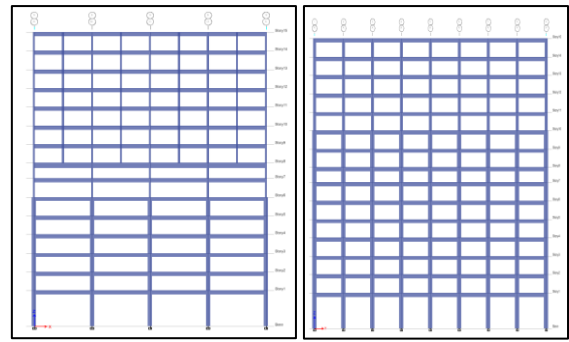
Elevation of Building Model-1 and 2 along y-dir & x-dir.
